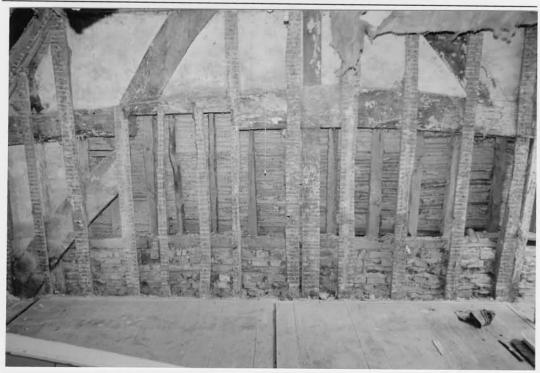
North end of hall on first floor, showing doorway cutting main beam, with closed truss of roof above, from SE
